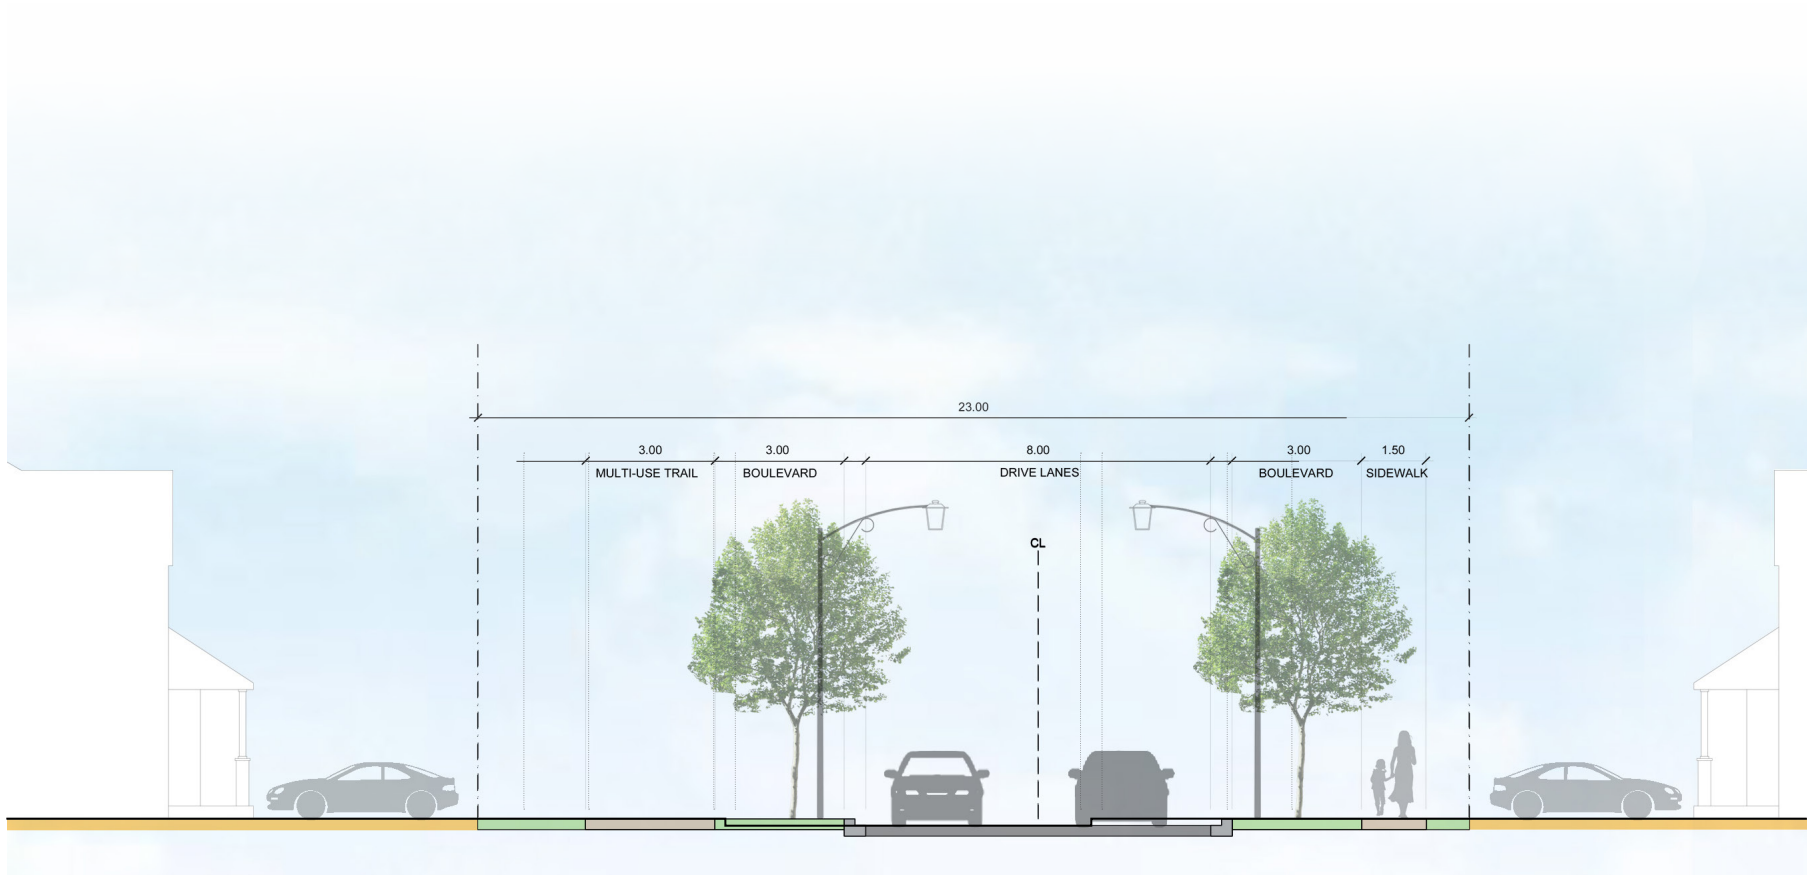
23.0m Local Road R.O.W with 3 metre Mutli-Use Trail
